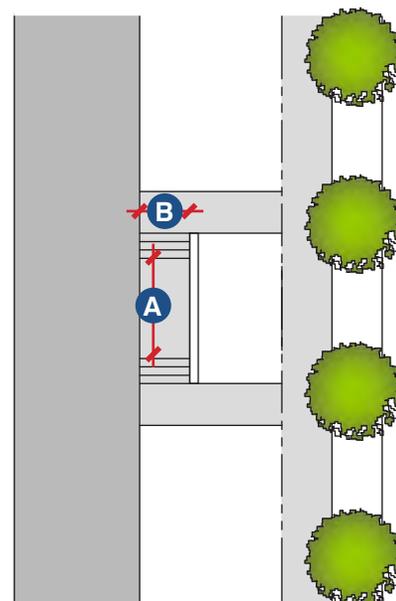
FIGURE: STOOP FRONTAGE PLAN VIEW DIAGRAM
